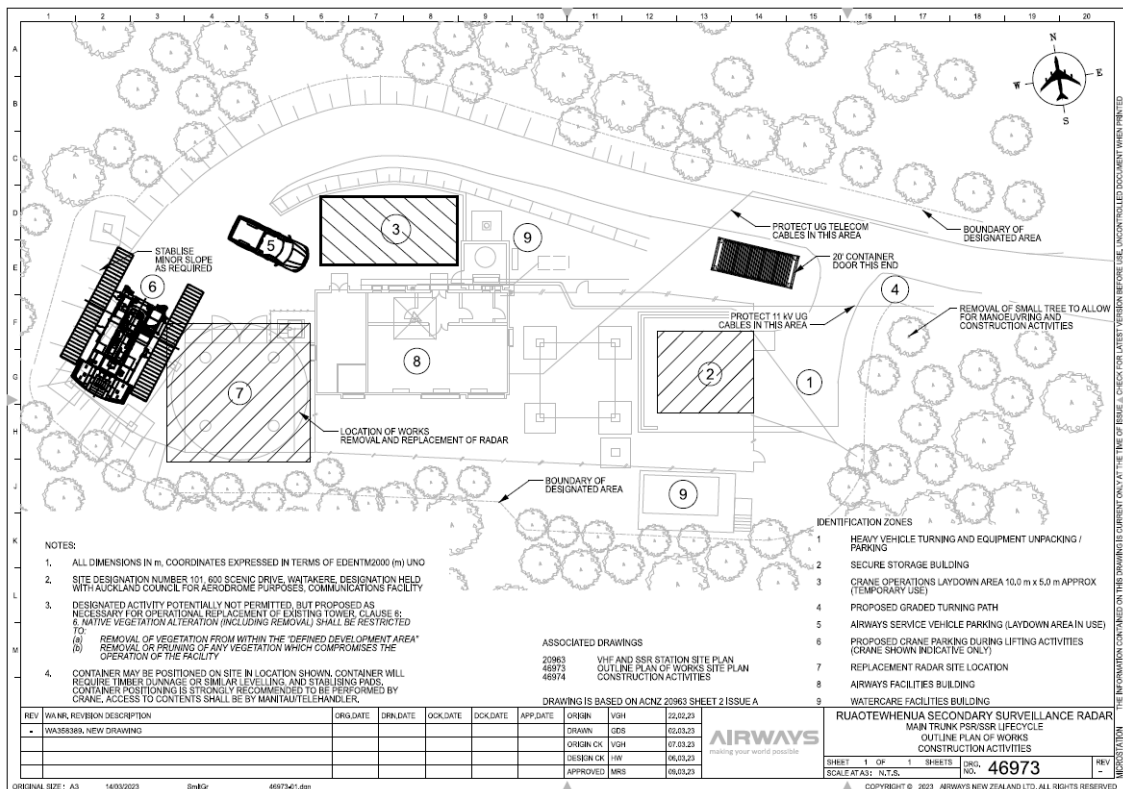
Ruaotewhenua Radar Project – Outline Plan of Works
